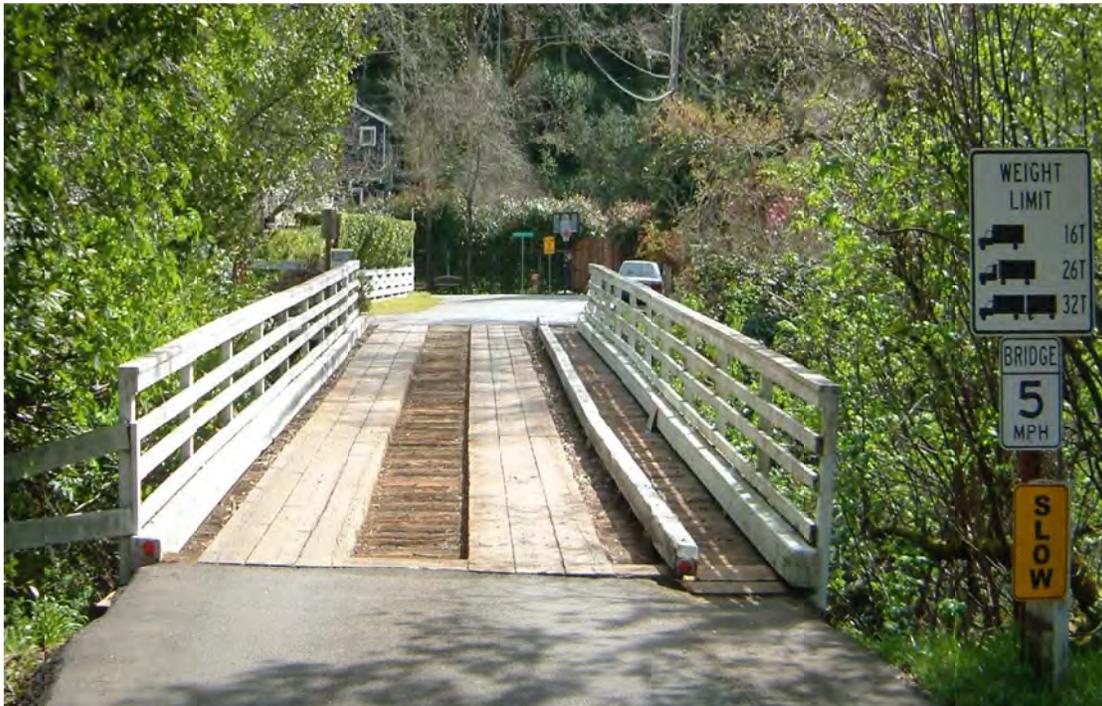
Bridge Deck - Looking east on bridge showing 2xdeck runner planks and wood railing
